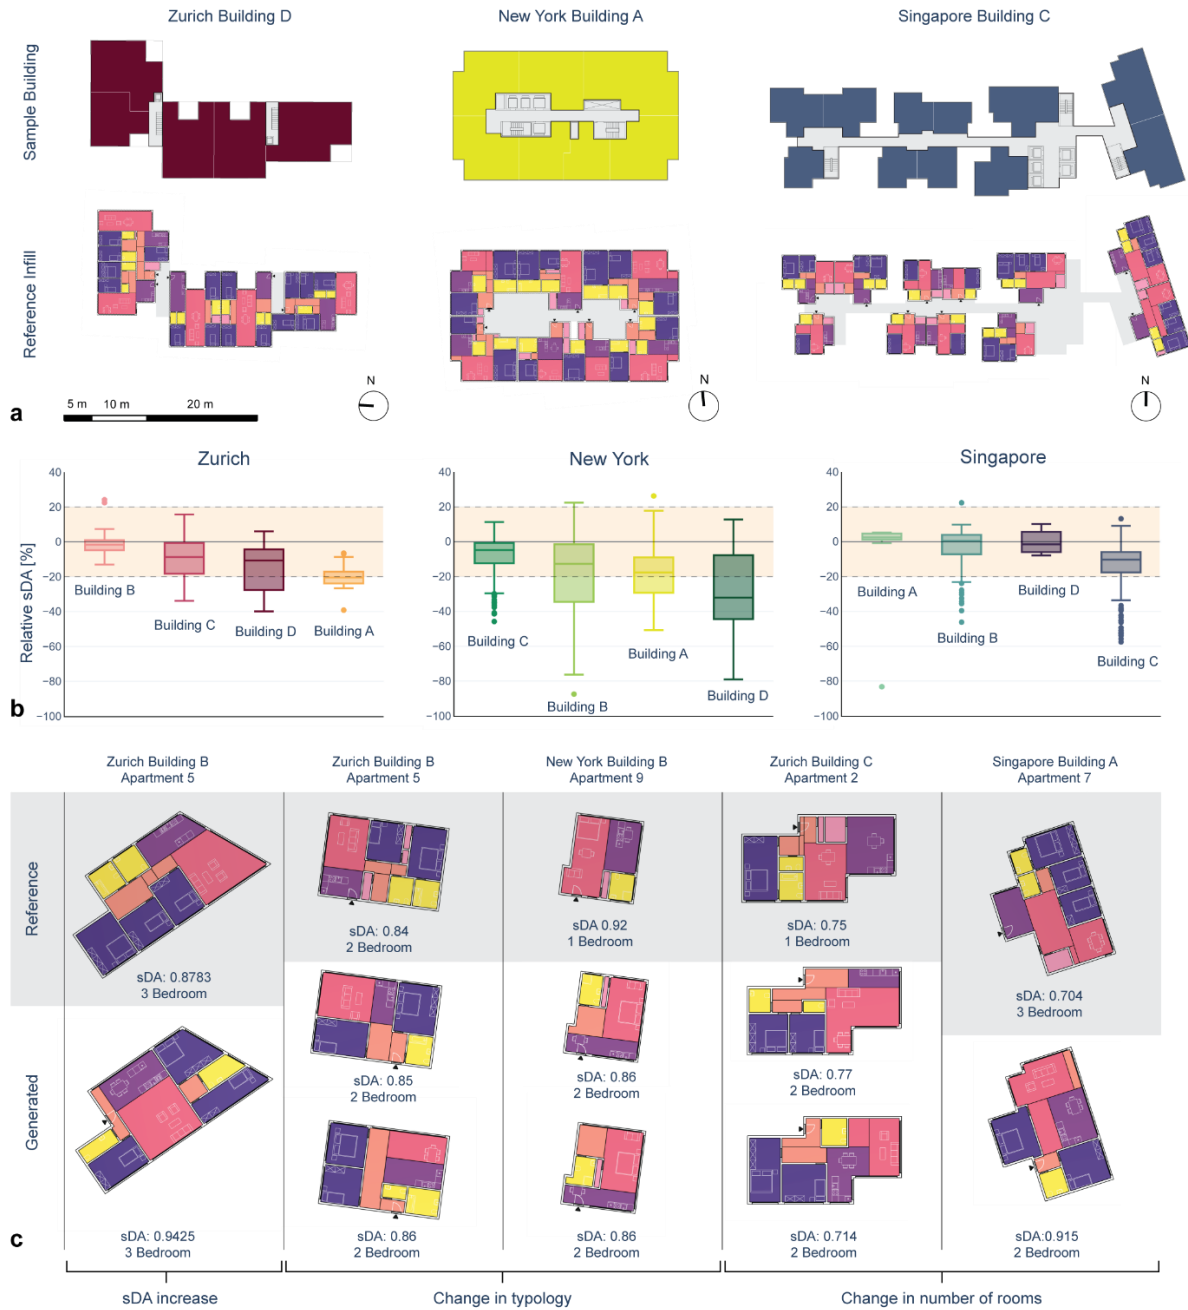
Three sample buildings with reference floor plans (a) that are being replaced by hypergraph generated floor plans (all buildings are defined in Extended Data Figures 1-3). The relative sDA performance of all successful floor plans with equal or more rooms (b) and single artificially generated floor plan examples (c) highlighting different opportunities.
